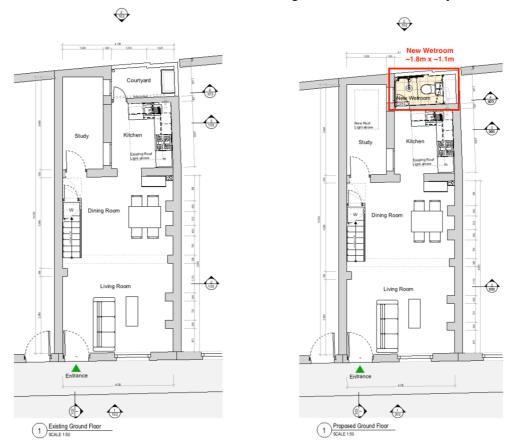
Existing and proposed courtyard area highlighting the new wet-room
